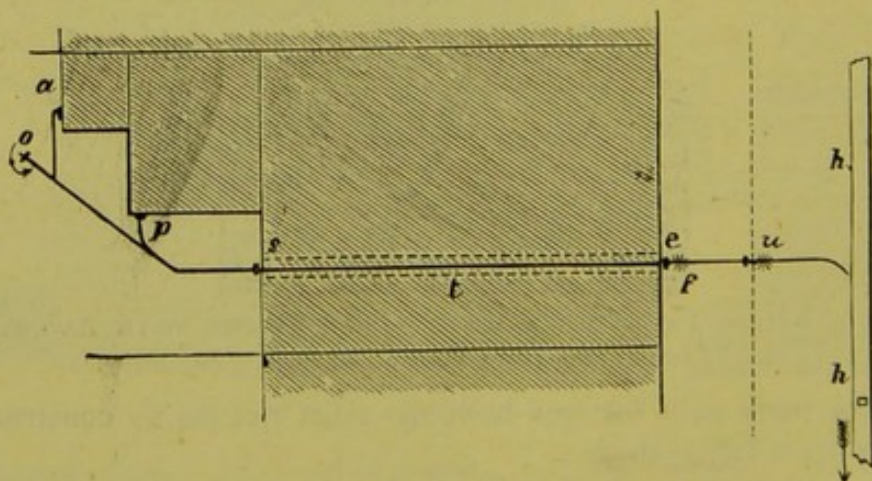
SCHEME OF THE DRAINAGE OF A HOUSE FORMING ONE OF A TERRACE (PLAN). For lettering see Fig. 11.
